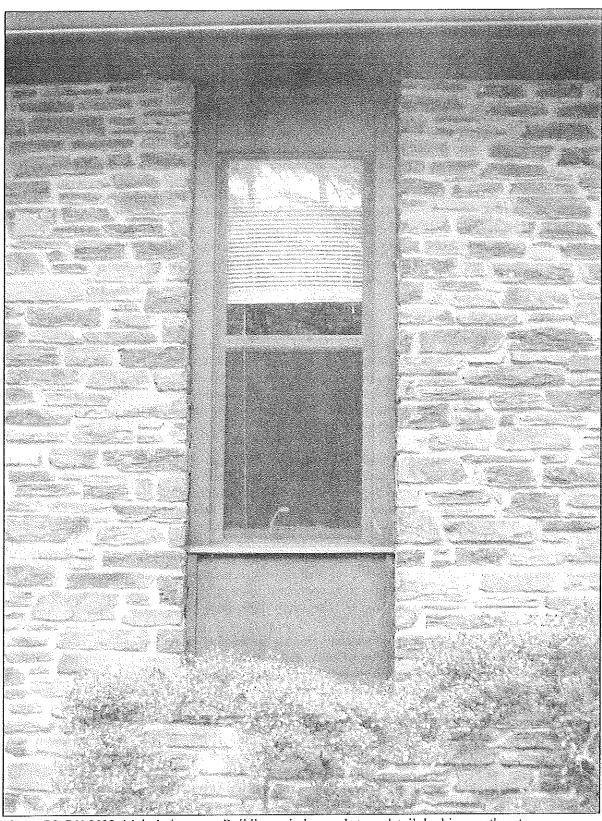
DH 3502: Main Laboratory Building, window and stone detail, looking northeast.
